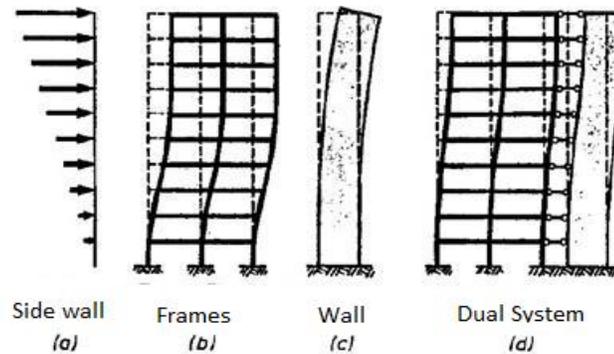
Distortions due to lateral forces in a frame element, wall and dual system.
